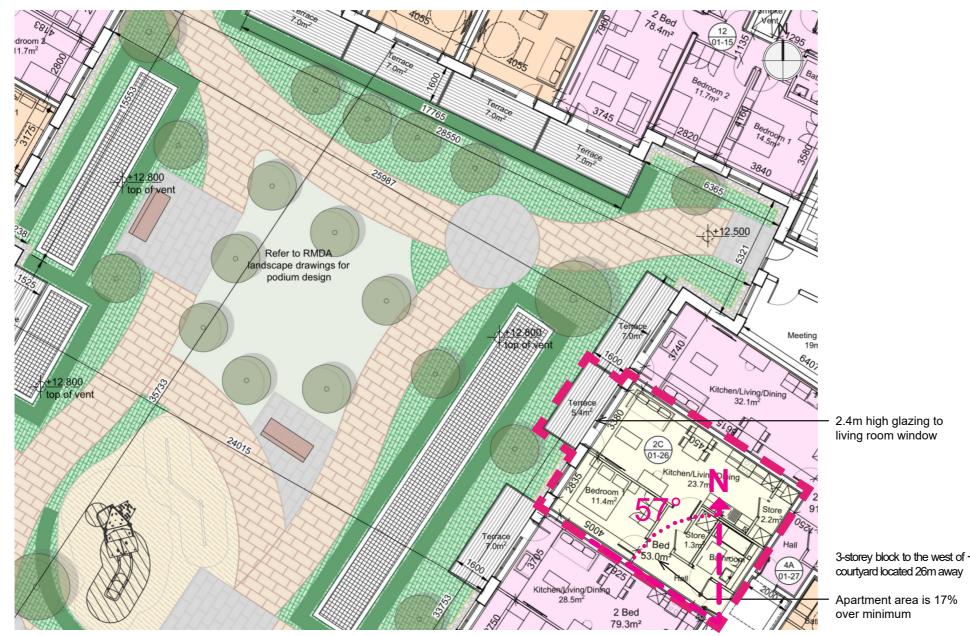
Block 5 First Floor Key Plan with Unit 05-01-26 highlighted
